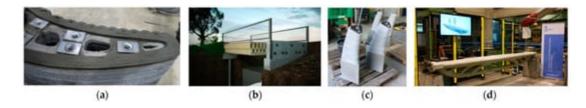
Printed concrete members reinforced using post-tensioning: (a) concrete bench (Lim et al., 2011), (b) conceptual design of concrete bridge deck by BAM [<u>69</u>], (c) concrete column [<u>70</u>], and (d) concrete girder [<u>71</u>].
